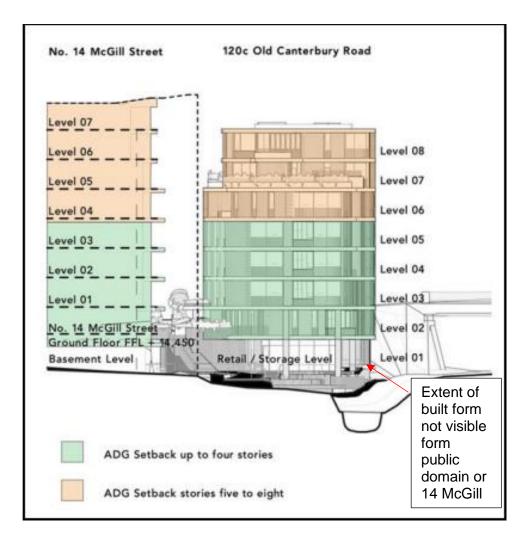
Height Blanket - Looking from the Lewisham Light Rail station towards the site
